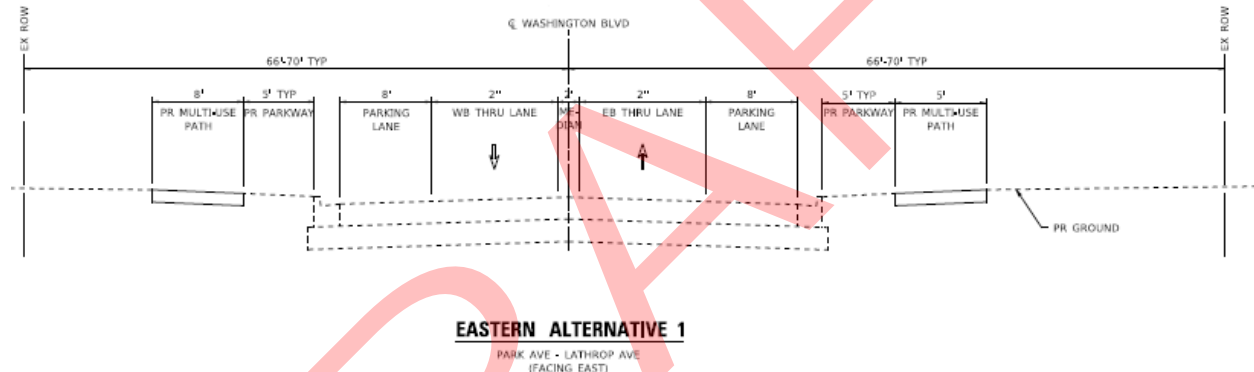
Proposed Eastern Typical Section Washington Blvd.
